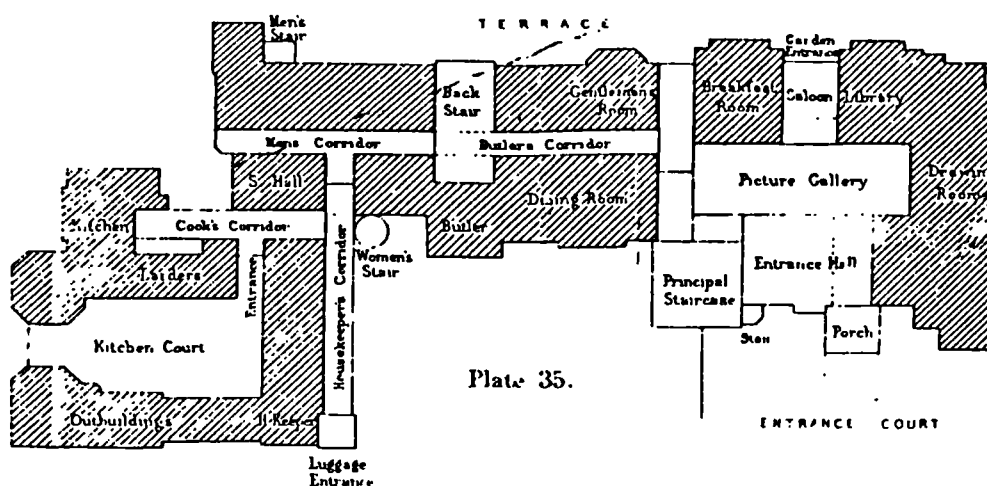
Thoroughfare plan of Robert Kerr. The issue of movement and privacy has been resolved by the use of Thoroughfares, 1864. (After Evans, 1978).
